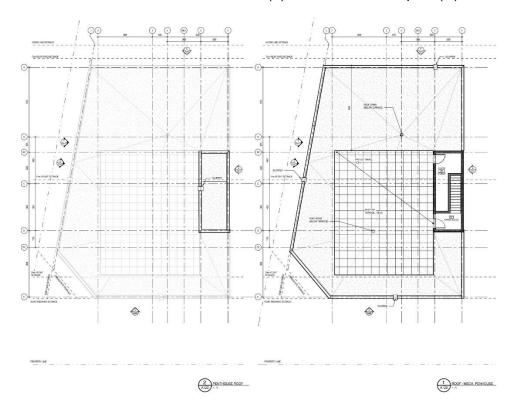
Penthouse Roof Plan (L) and Roof/Mechanical Penthouse Plan (R)
